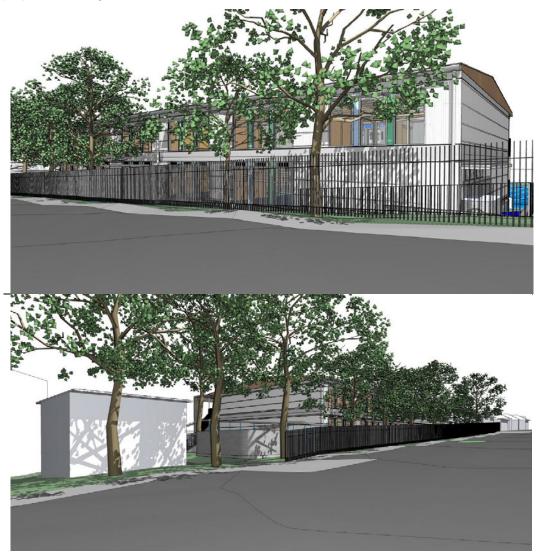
Perspectives of the proposed building as viewed from Forrest Road
